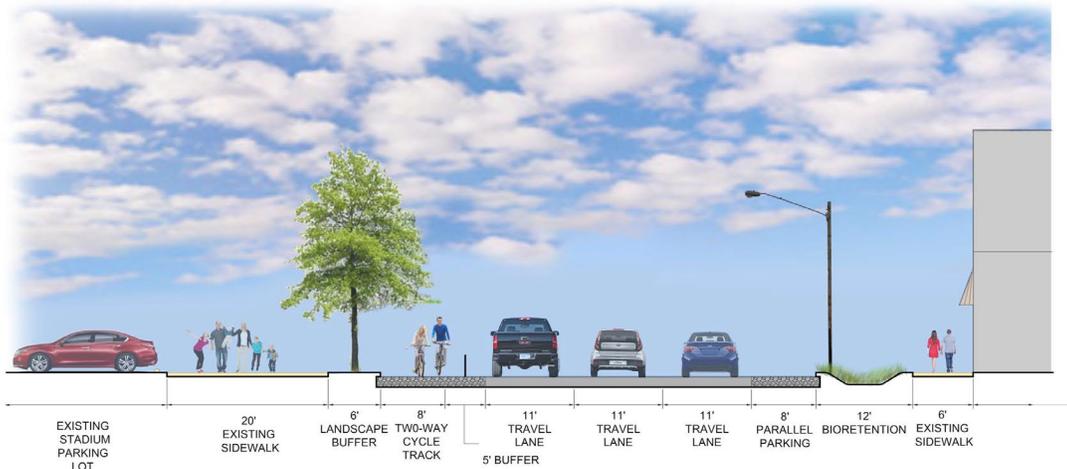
3rd Avenue Complete Street (25th Street to 16th Street)
